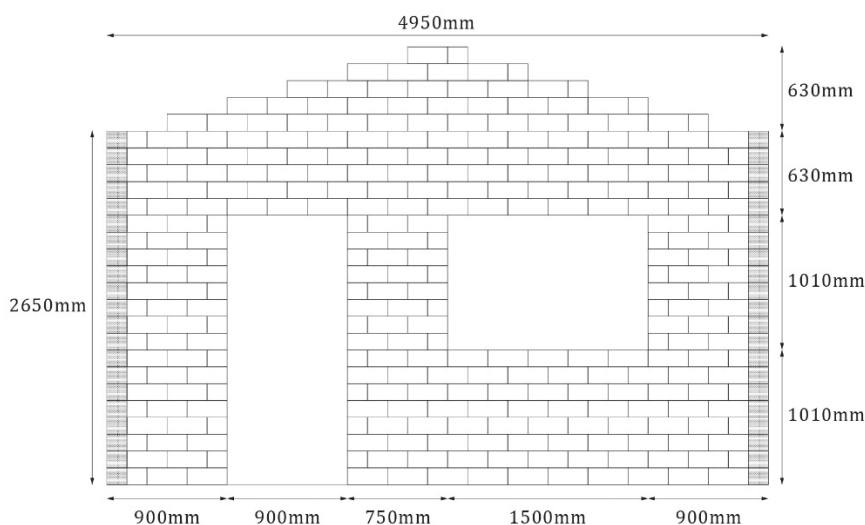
Wall W2 layout and dimensions for reduced window opening
